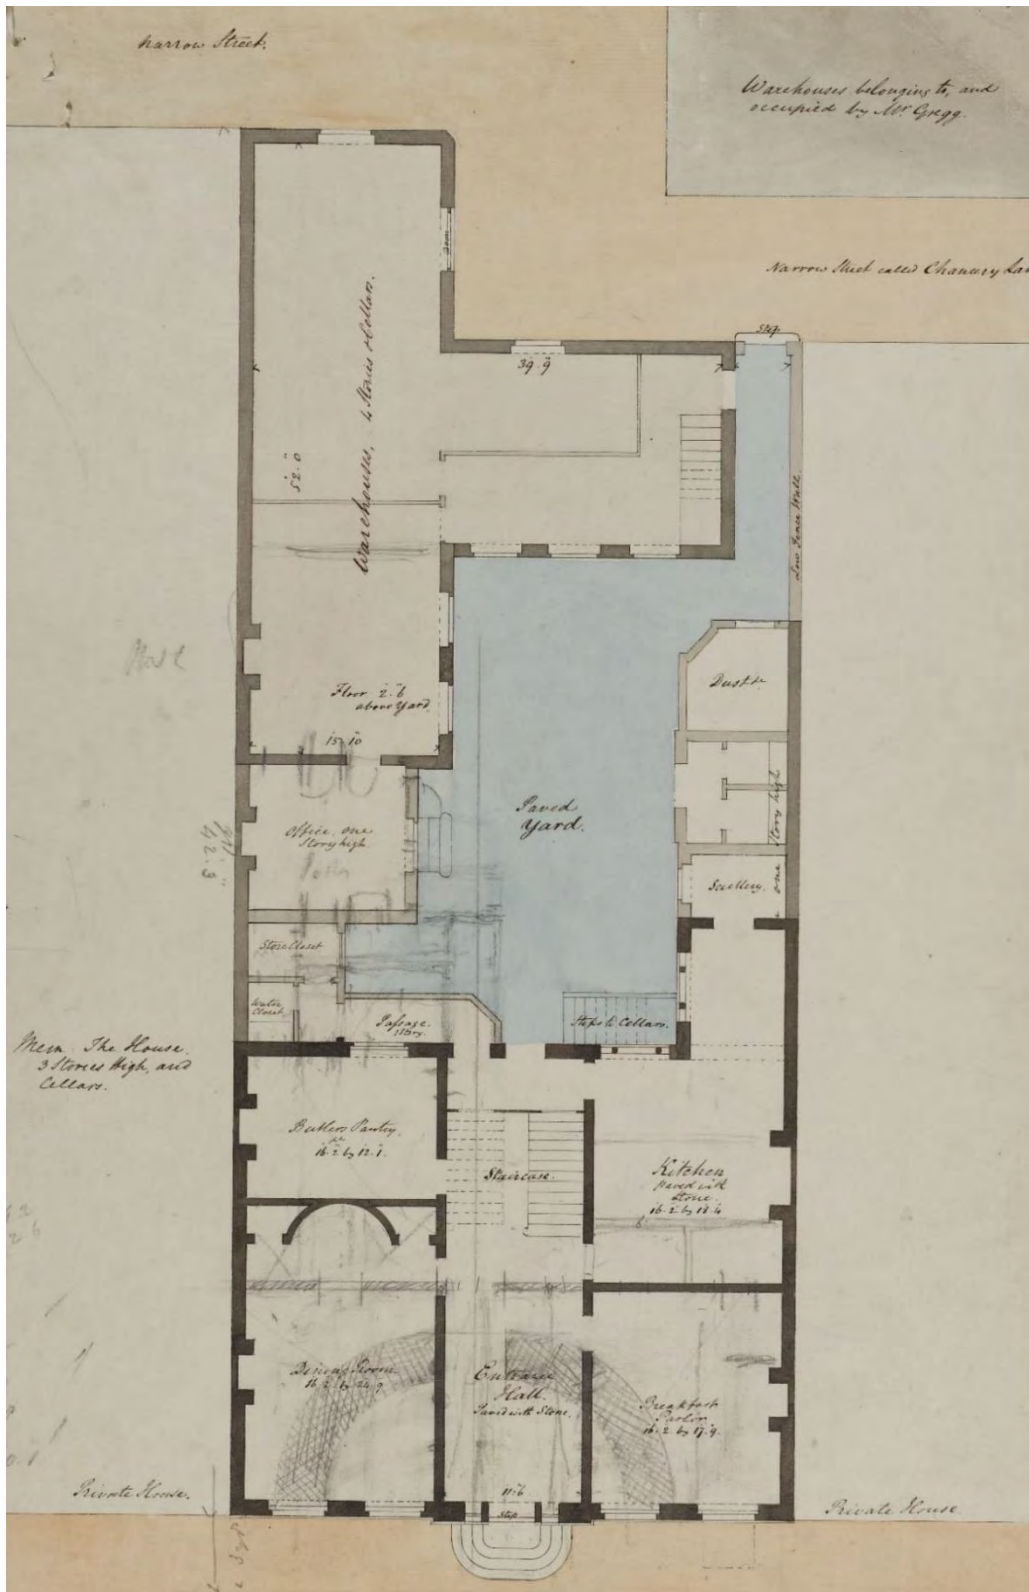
Floor Plan of 35 King Street, Manchester (1826) (Sir John Soane Collection: SM (2) 56/1/1A: David Mocatta, Site Plan of House in King Street, 1826)
